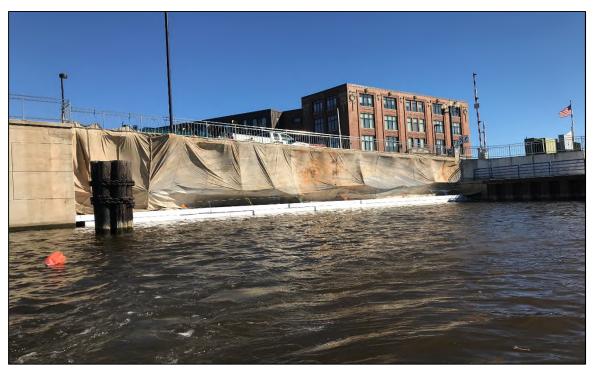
View of the inaccessible area of the Inner Harbor (Grids 112 and 114) beneath the southern portion of the 8th Street Bridge.
